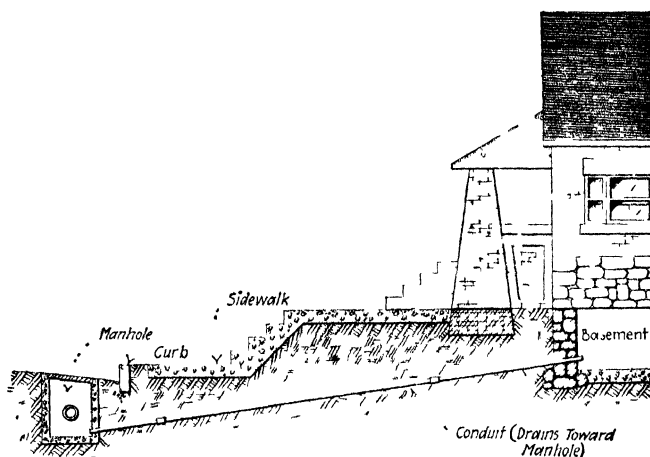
Private underground entrance conduit from manhole to residence. Drainage is toward manhole (preferable direction).
